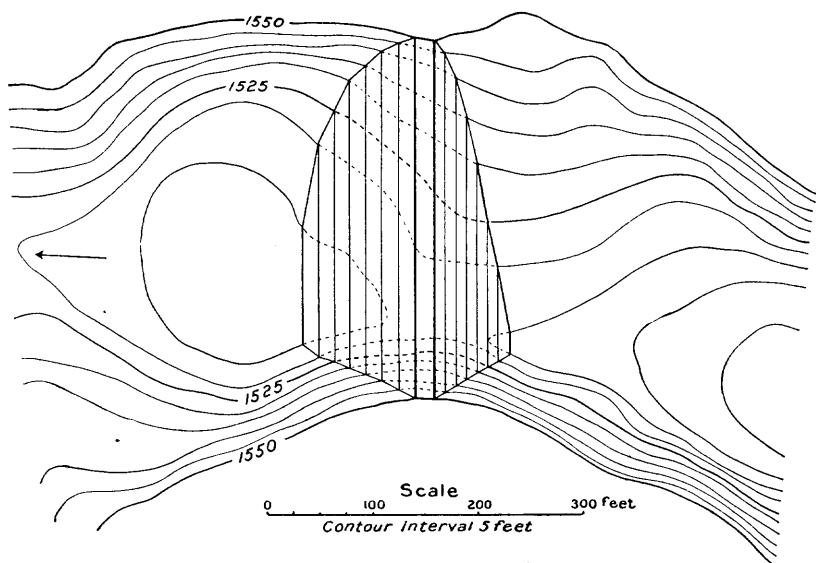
Mono dam site, showing plan of subsidiary earth dam for 110-foot loose-rock-fill dam.
